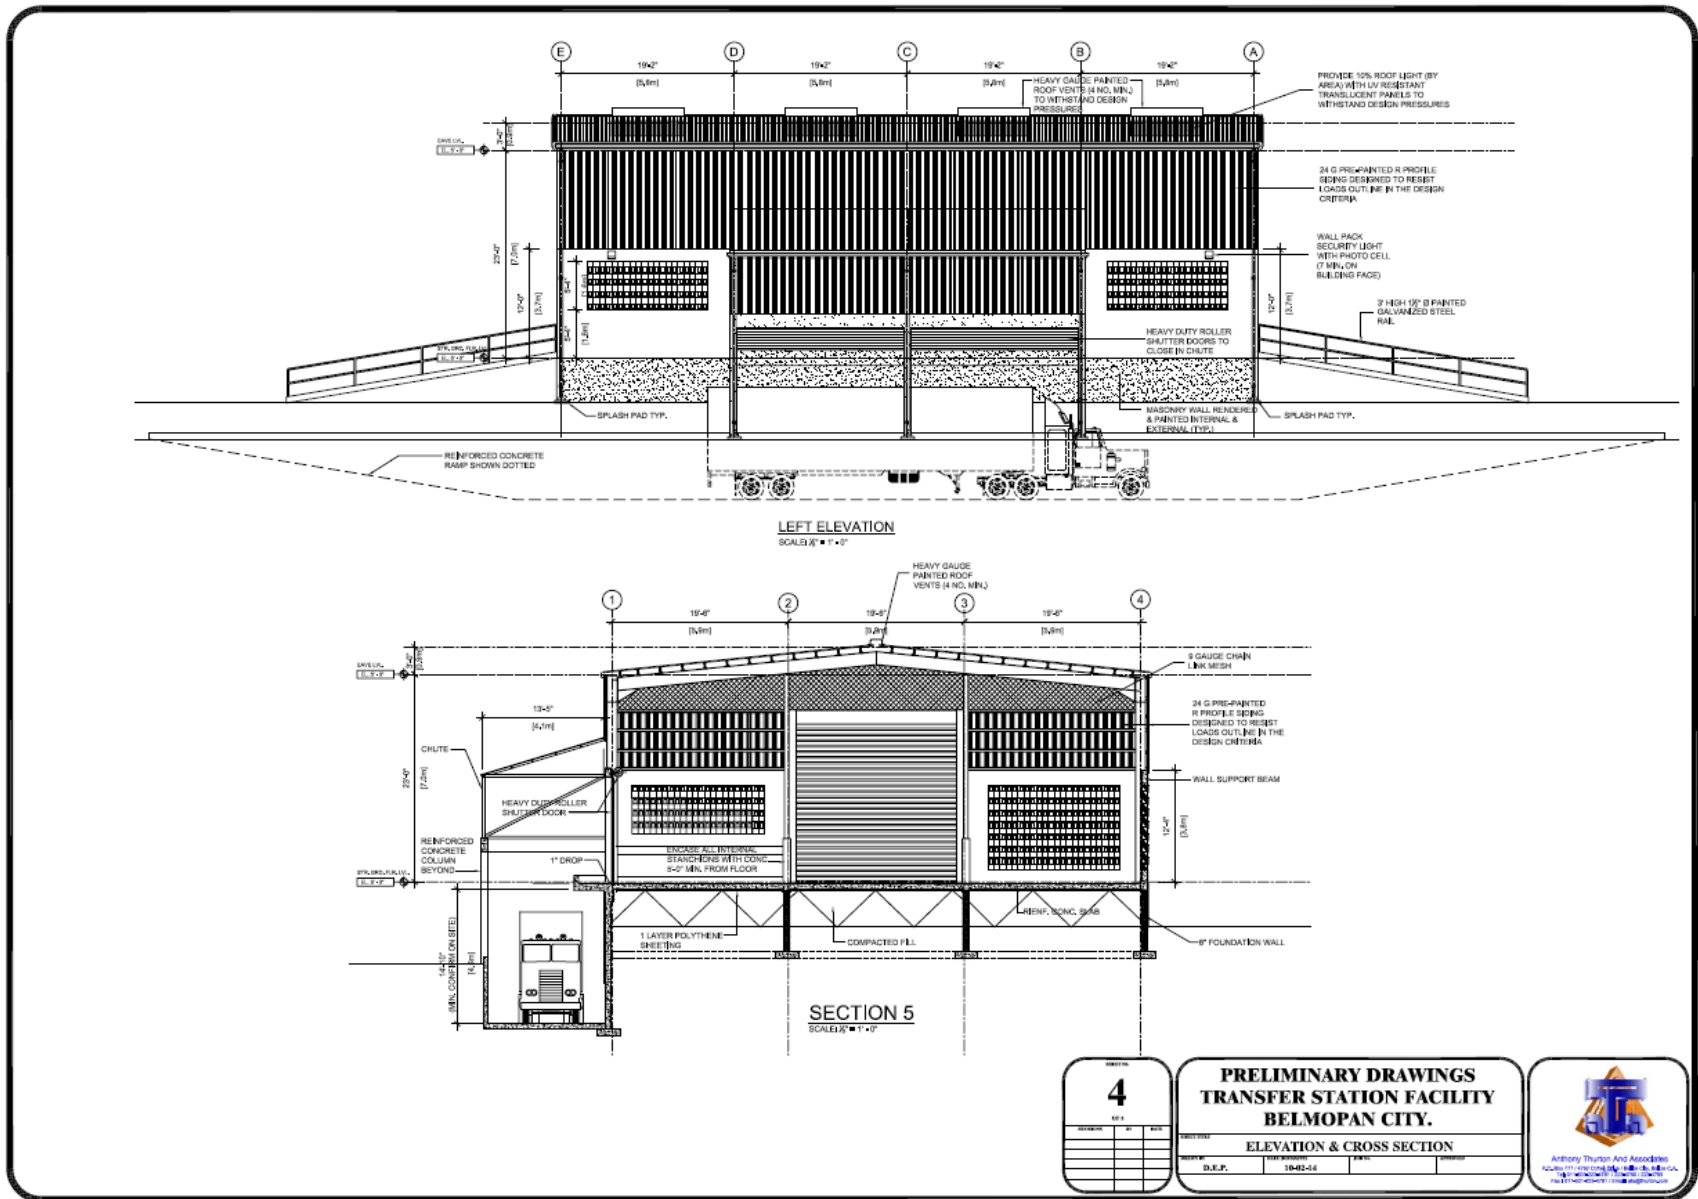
Proposed Belmopan Transfer Station Elevations and Cross Section
